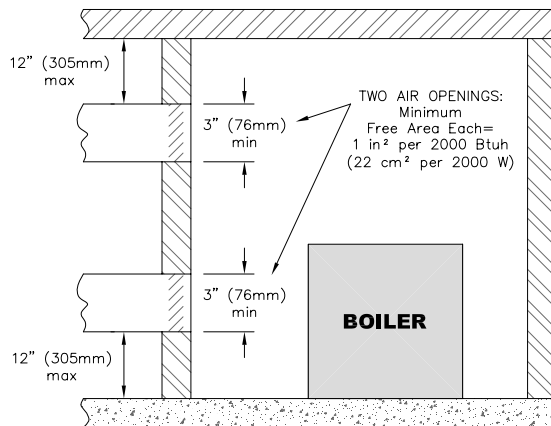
Air Openings – All Air from Outdoors through Horizontal Ducts
